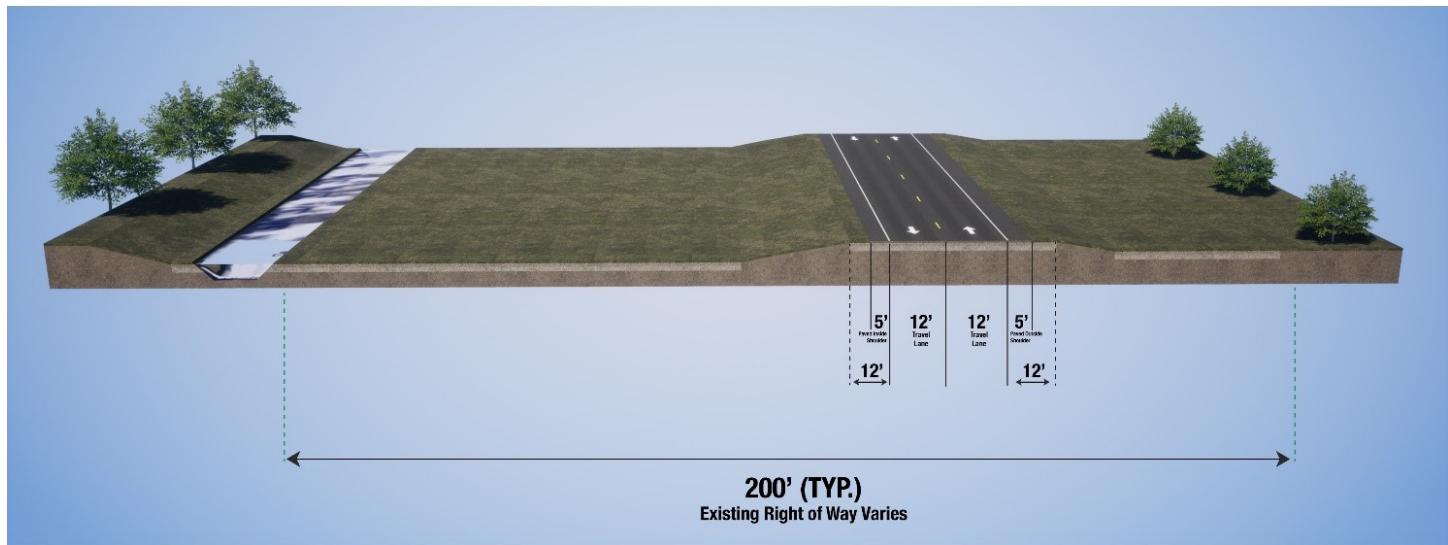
Existing S.R. 70 Roadway Typical Section from west of SE Townsend Avenue to SE Highlands County Line Road
